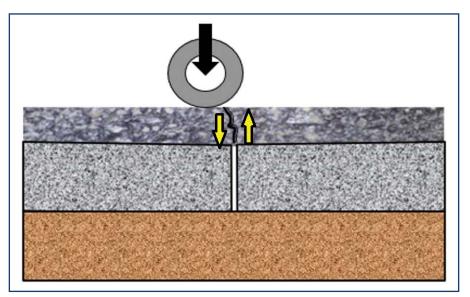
Mode 3: Poor load transfer of underlying pavement. (Source: Bennert 2021)
